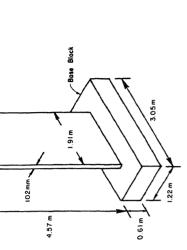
Nominal Dimensions of Test Specimen with Rectangular Cross Section
